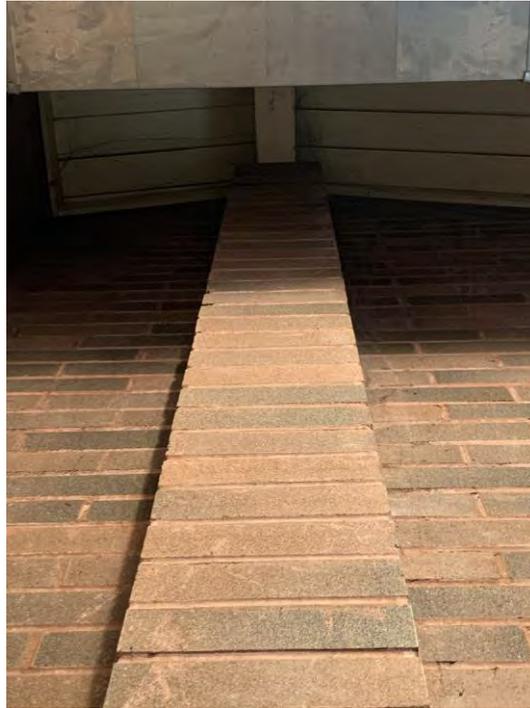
Masonry Pilaster Supporting Roof Framing
